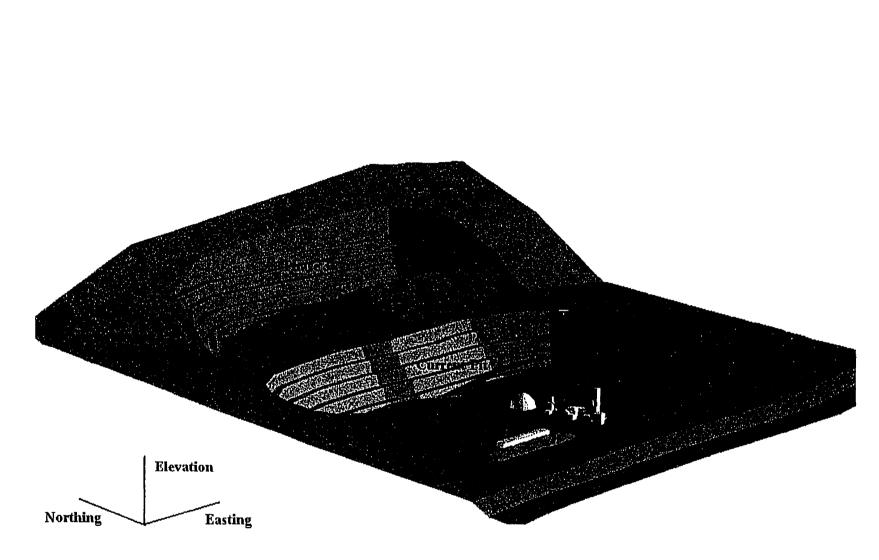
Tri-dimensional View of the Long-Term Open Pit Mine Plan
